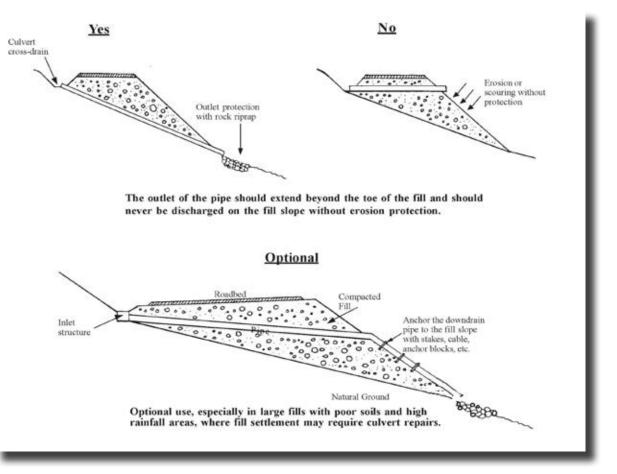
A cross-drain pipe should exit at the toe of a fill.
